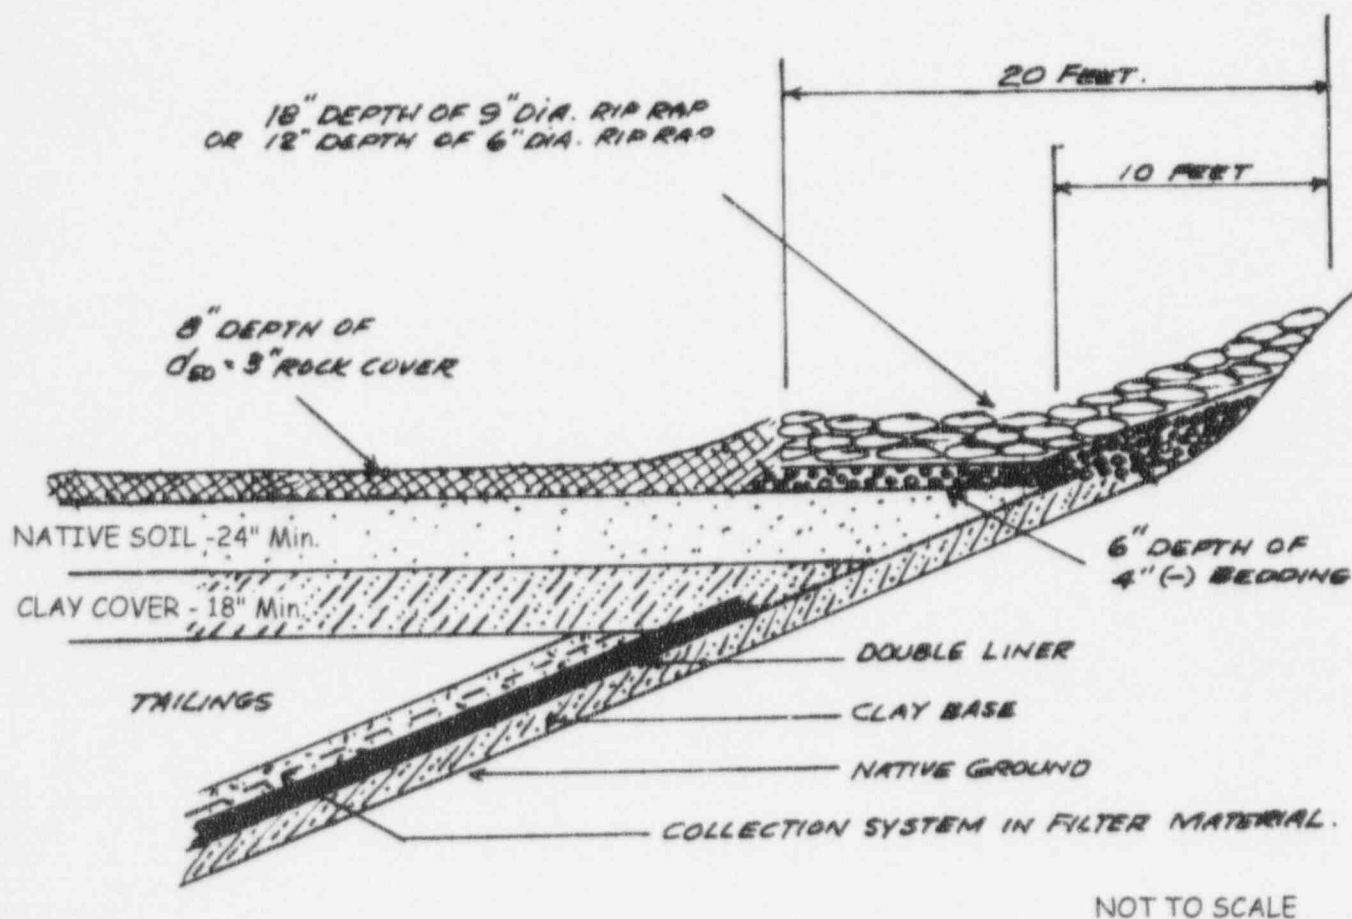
Section (G-G') Typical section of rip rap transition zone on east and north sides of the impoundment. (See Figure 3, Reclamation Plan Map)
